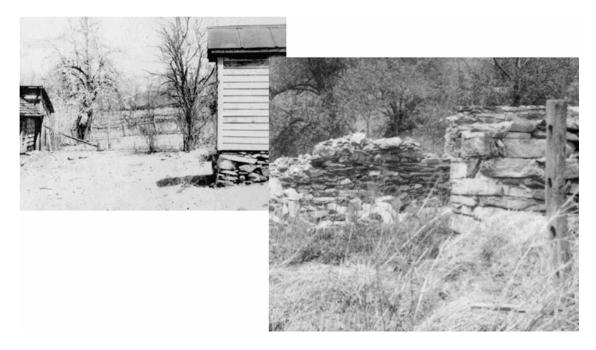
Examples of stone foundations and piers. Stone wall at right (tract 94) is from destroyed barn, judging by its straightness and height. It is mortared, unlike stonework under small building on left (tract 18) (c. 1937, CMP tract files).
